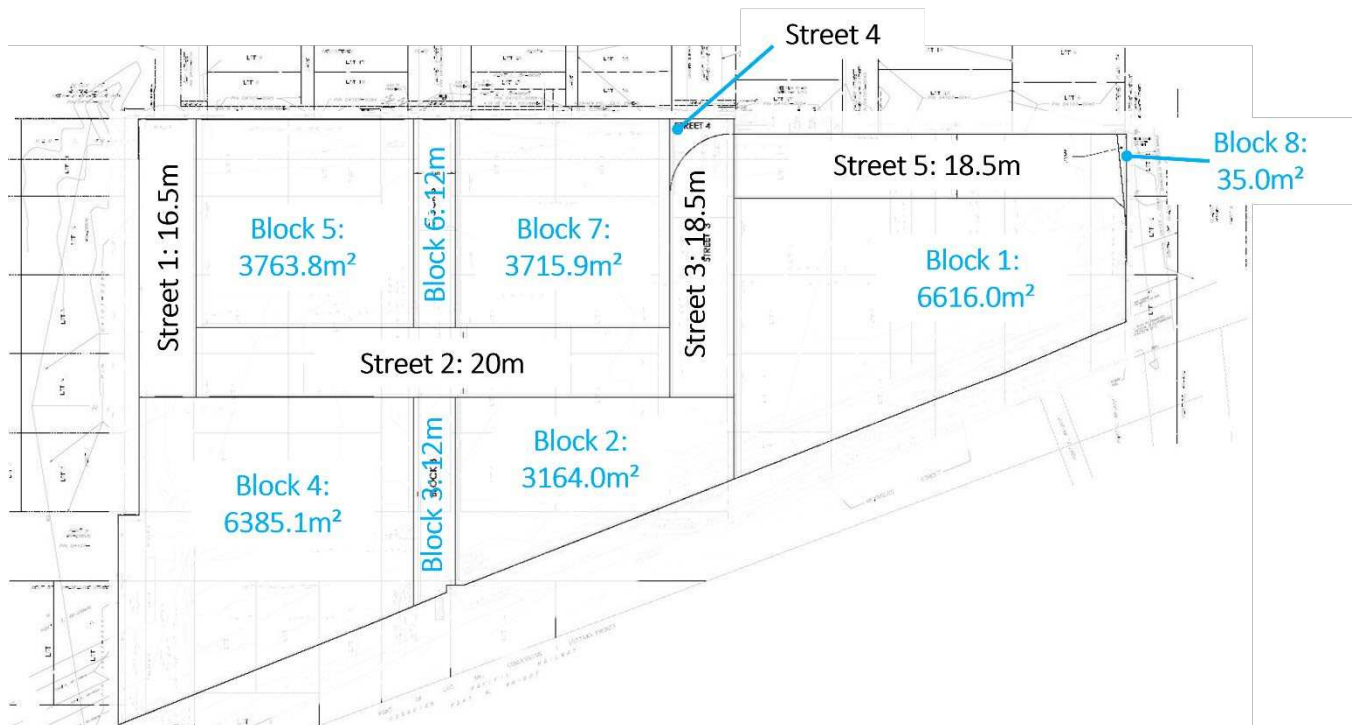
Revised Gladstone Village Draft Plan of Subdivision.
